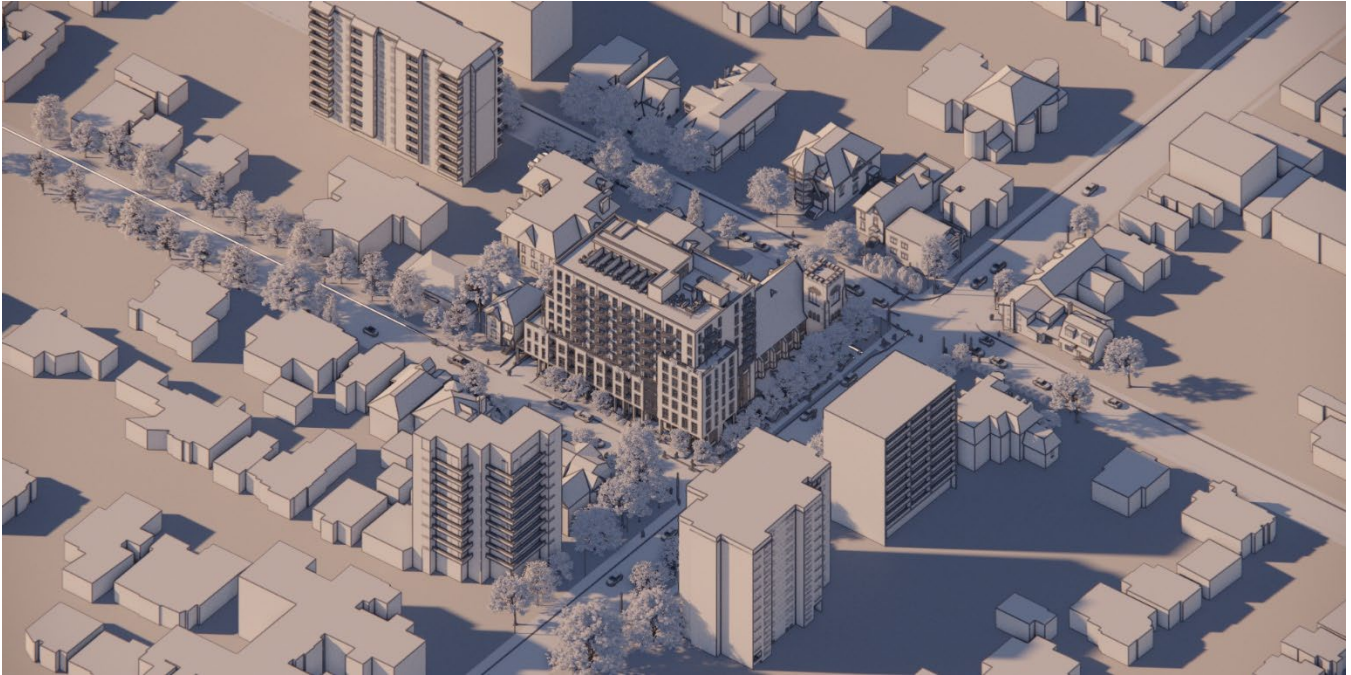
Aerial view looking northeast, with the building shown in context of other tall buildings (provided by Linebox Studio)
